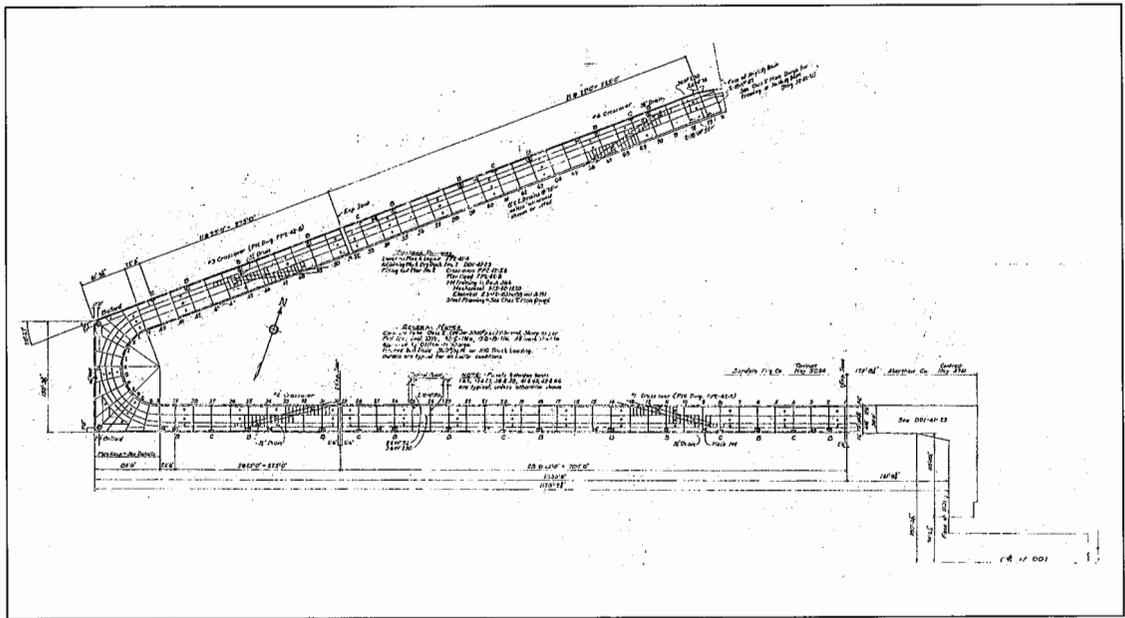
Layout of Fitting Out Pier 2 from a 1941 archive design drawing.
